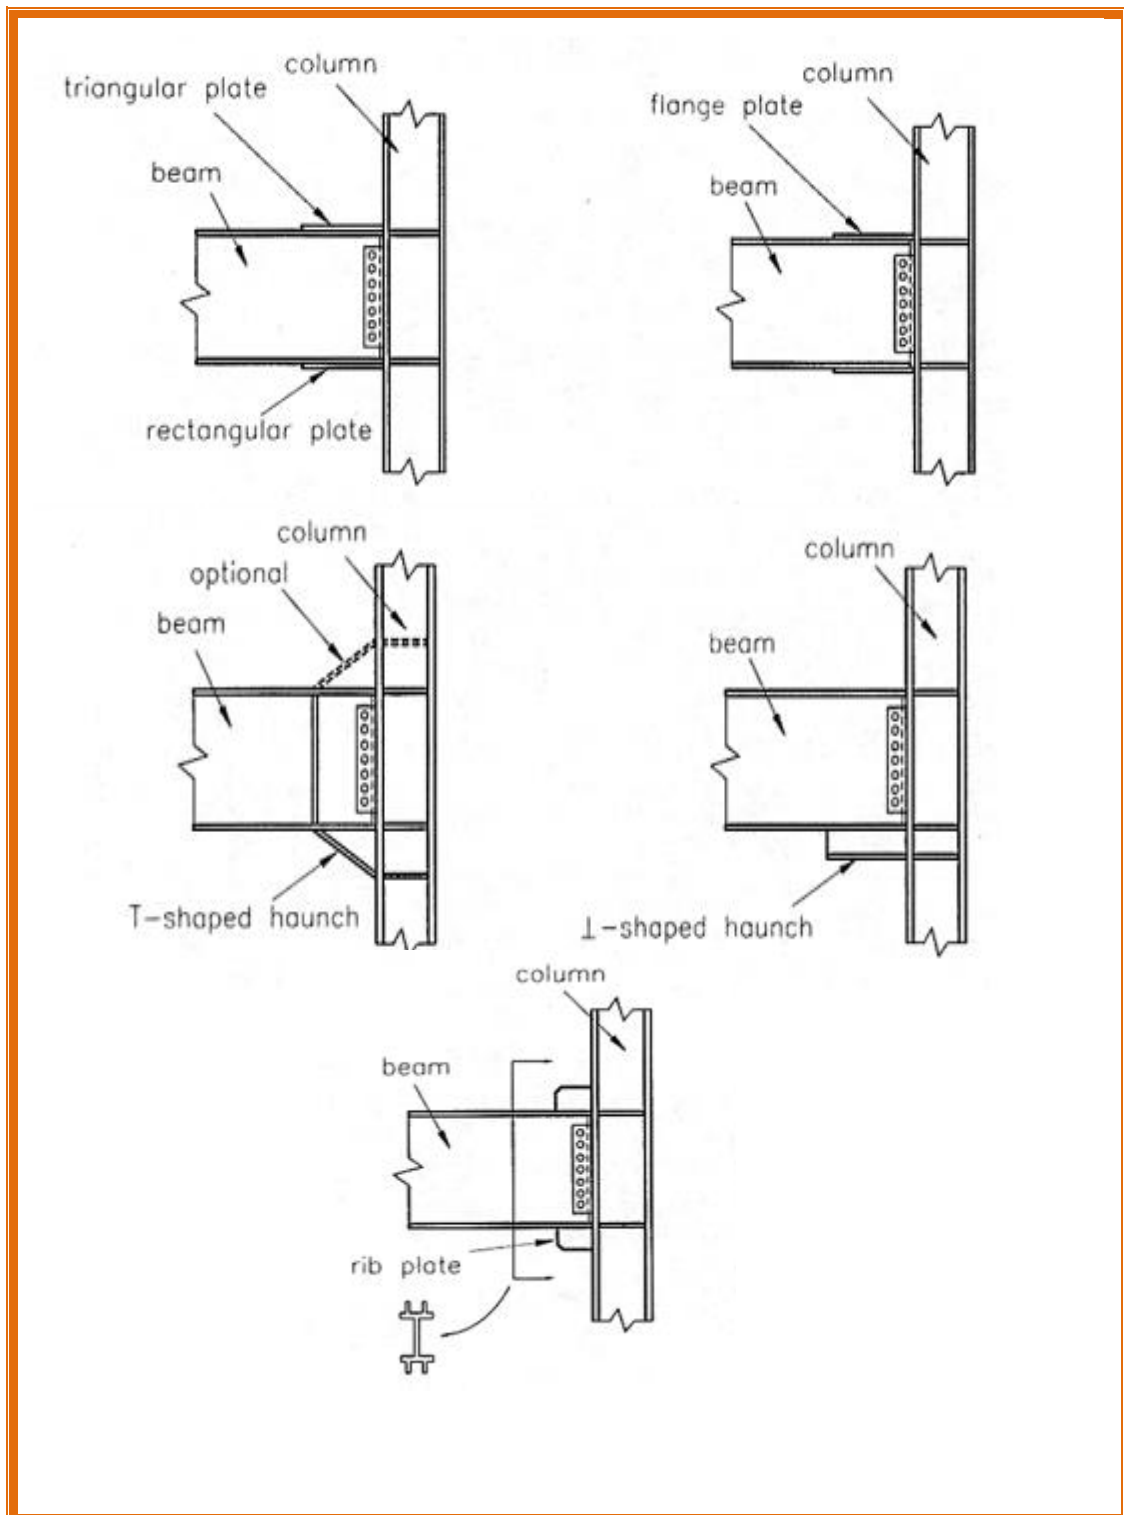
Reinforced moment connections for steel structure with (Cover plates, welded flange plates, triangular haunches, straight haunch, and rib plates. (Uang C-M., 1998).
